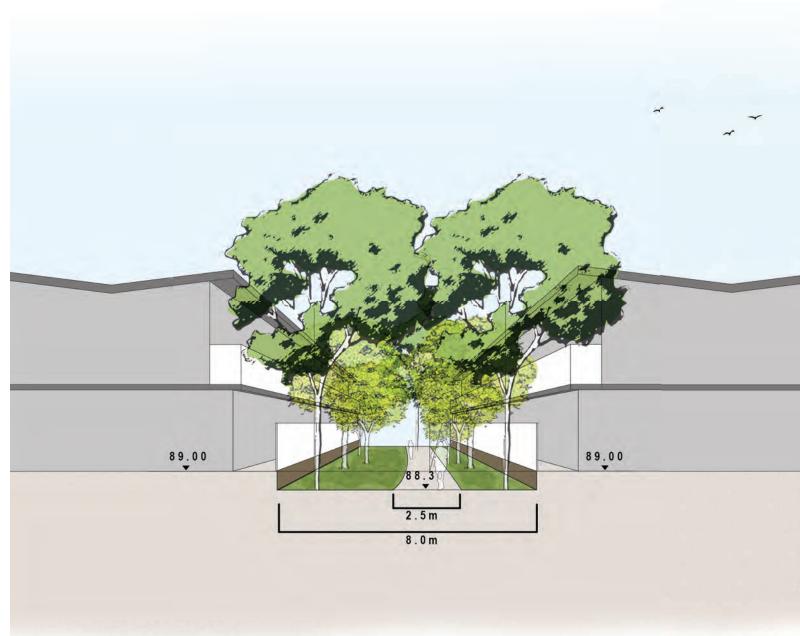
LINKING SPACE SECTION HH (ILLUSTRATIVE ONLY) NOTE: ALL LEVELS ARE VERY PRELIMINARY AND SUBJECT TO DESIGN DEVELOPMENT OF THE MASTER PLAN AND URBAN DESIGN
